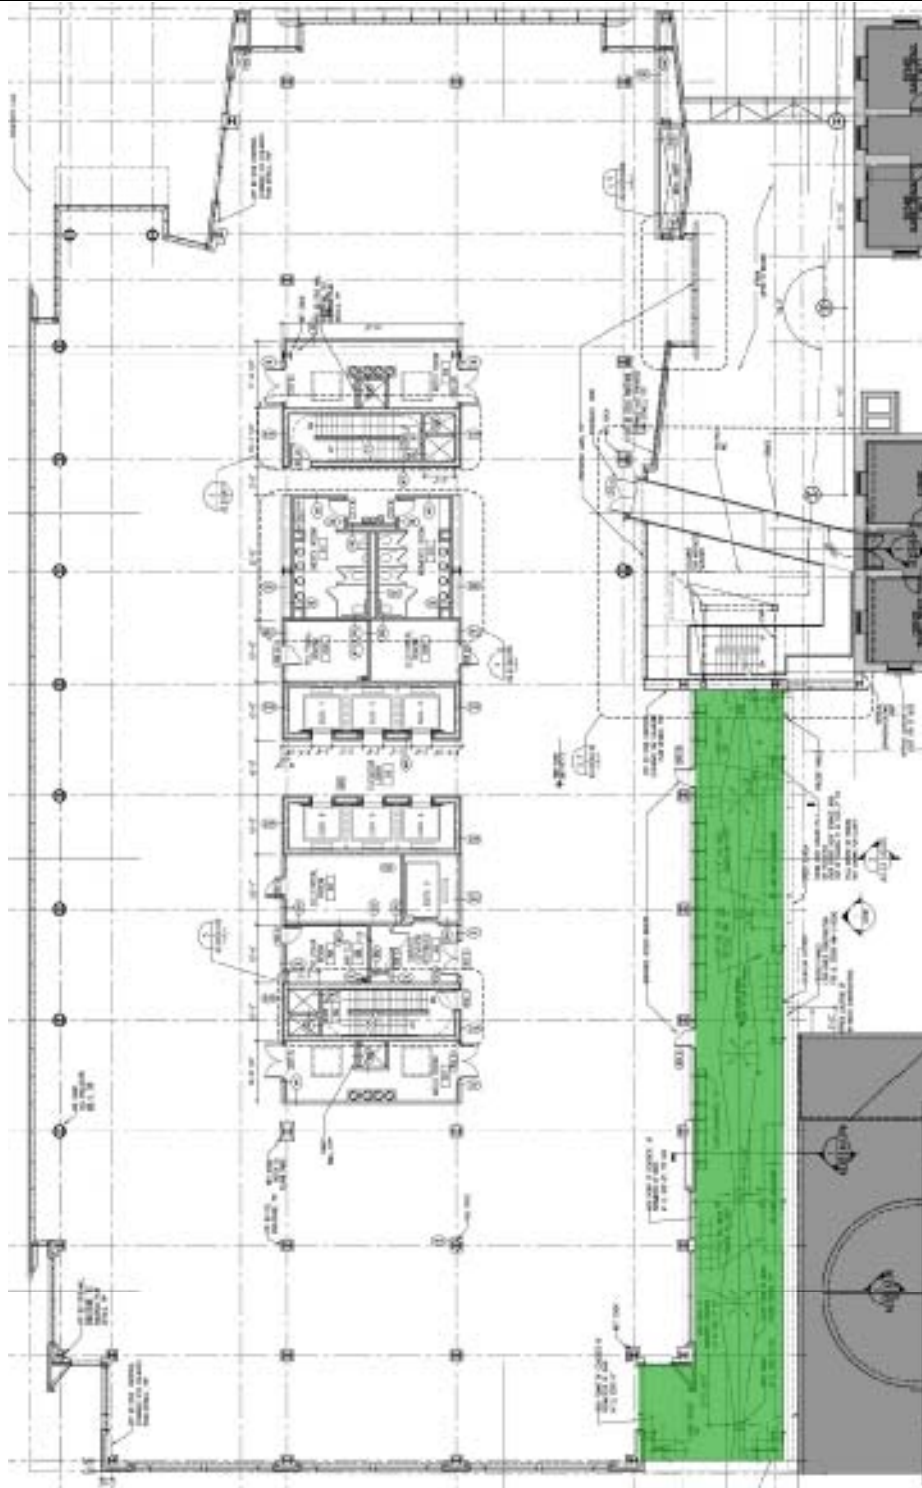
Location of Green Roof on 3rd Floor Terrace
